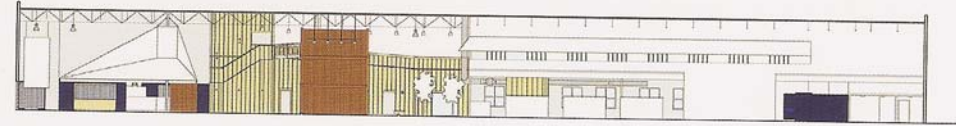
The section above is taken through the 'courtyard' portion of the building where the pond is located
